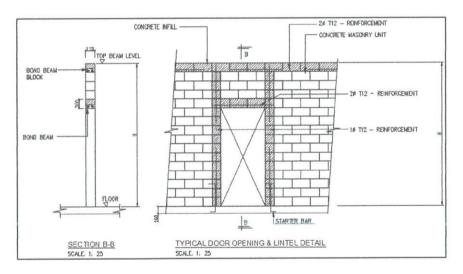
Installation of Horizontal Rebar at Door (Source: Modul Pemasangan CMU Projek PPR Tanjong Karang)
